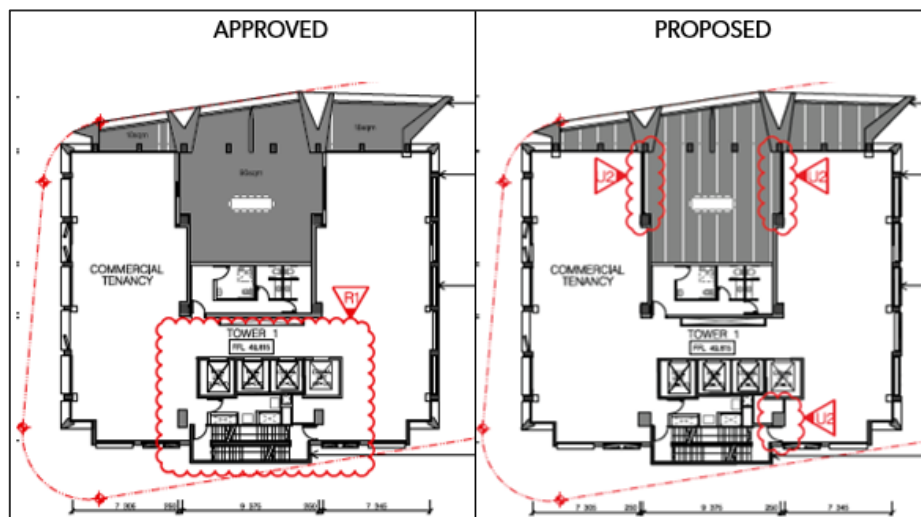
| Revised lift core arrangement over Levels 3-5 (Base source: Approved Plans MOD 7 and Applicant's Modification Report).
